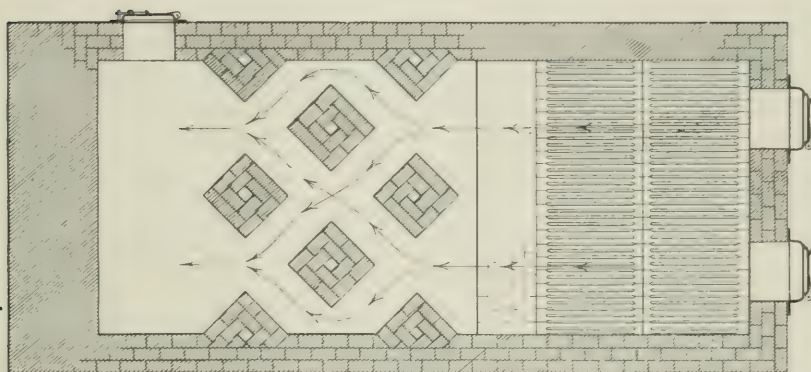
PLAN OF APPARATUS SHOWN IN FIG. 2 ILLUSTRATING MIXING PIERS.
